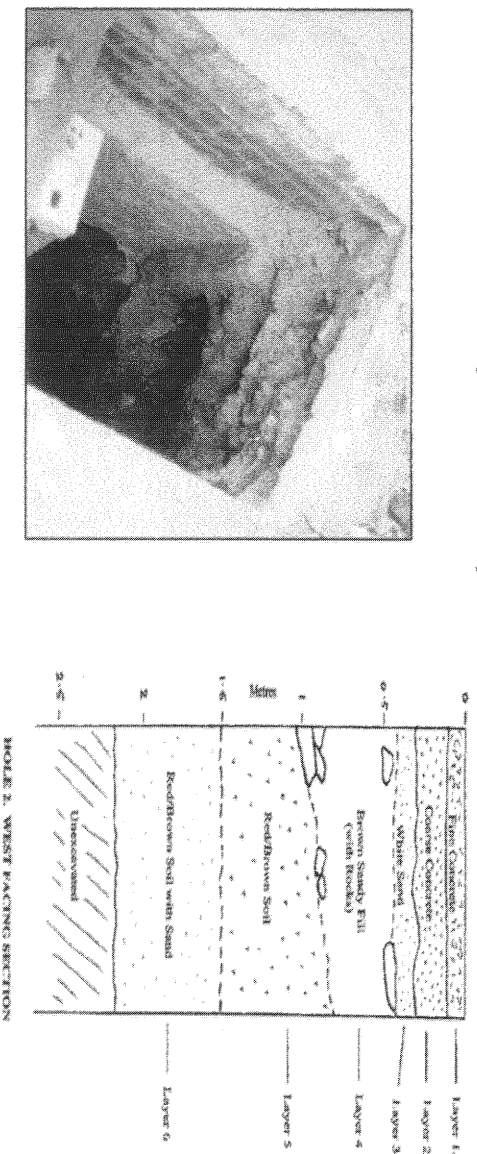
View of Hole 2 showing the brick wall adjacent to Prestwich Street and the deep foundation column in the corner of the hole
